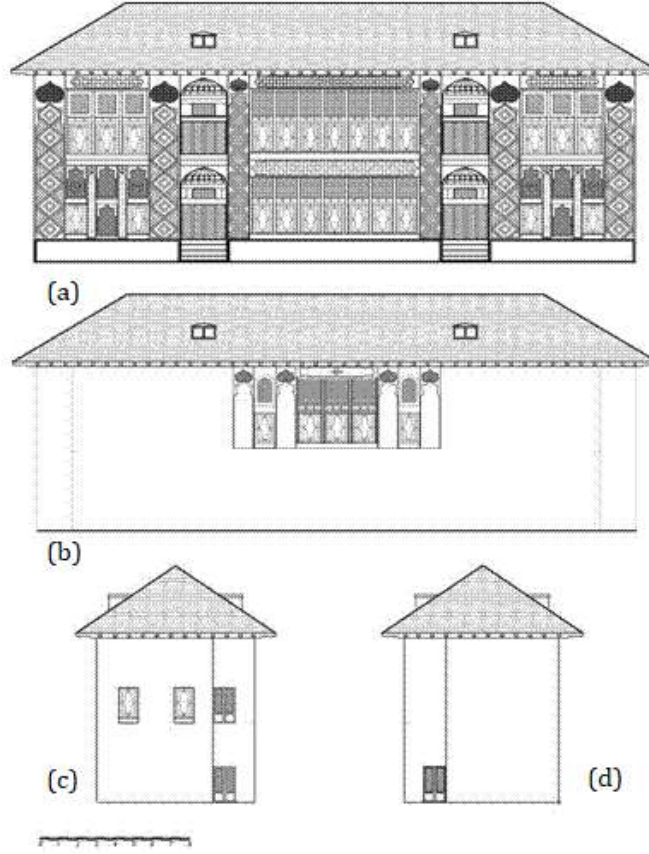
Facades of the Sheki Khan Palace: a) south facade, b) north facade, c) west facade, d) east facade (The State Tourism Agency of the Republic of Azerbaijan, 2020)
